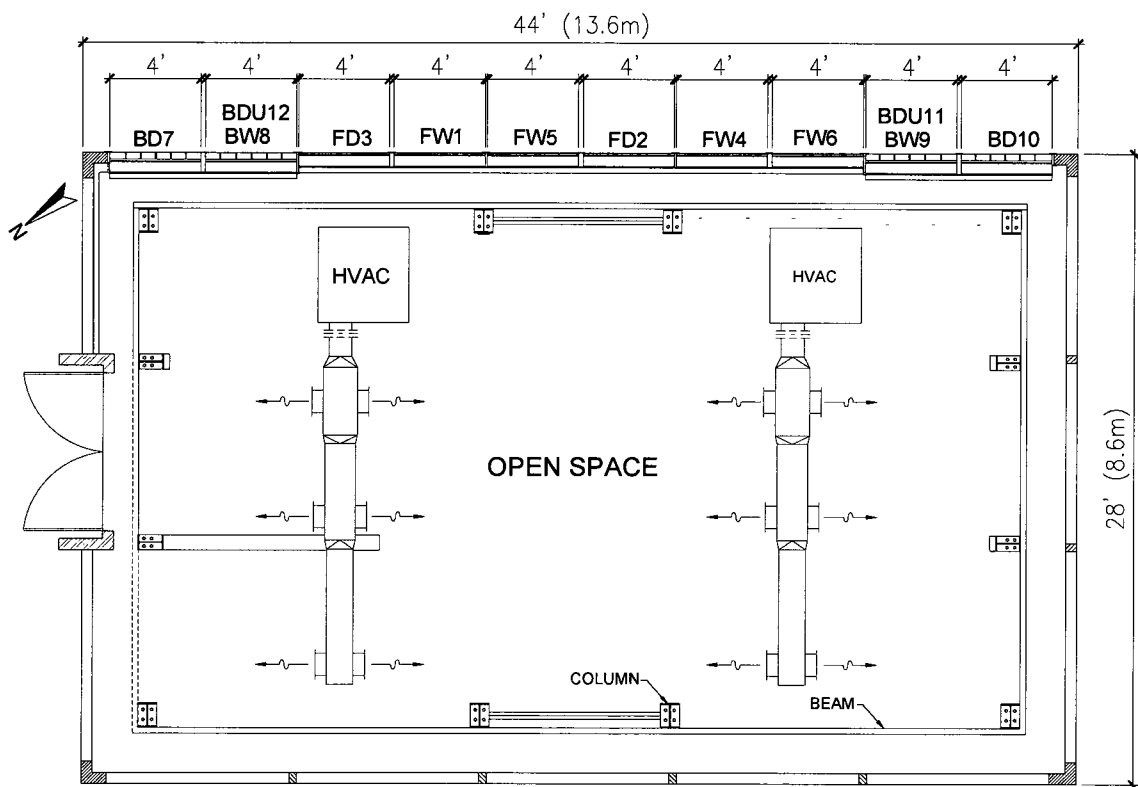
Plan view of the Building Envelope Test Facility at the Burnaby campus of BCIT.
